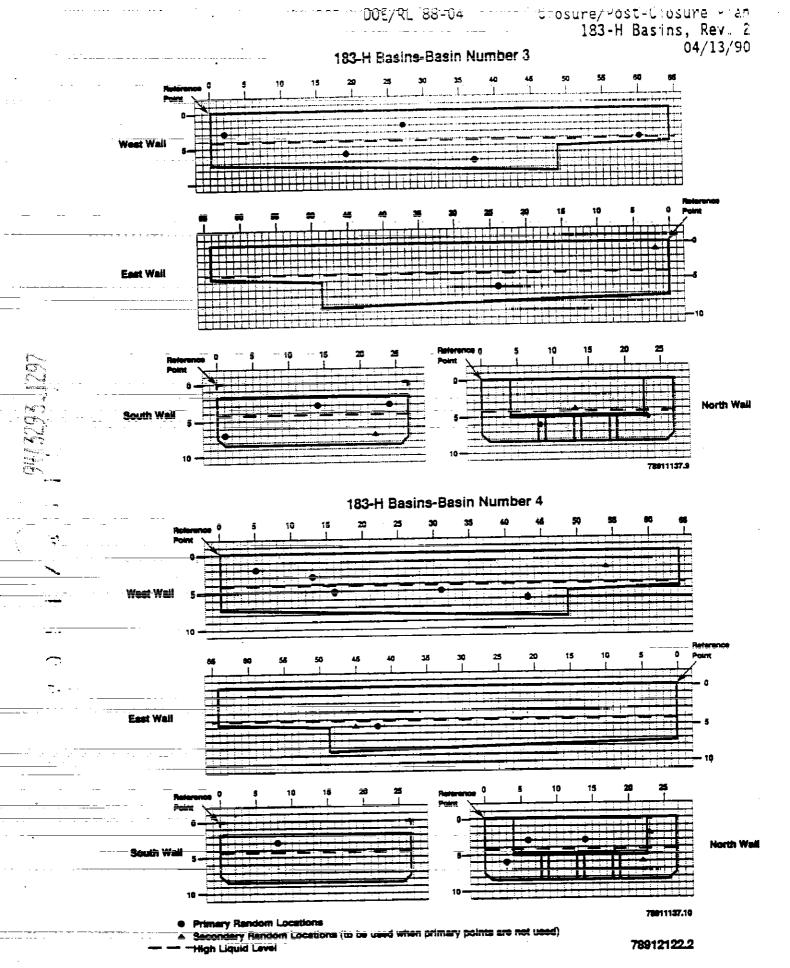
Concrete Wall Sample Locations for Basin Numbers 3 and 4.
